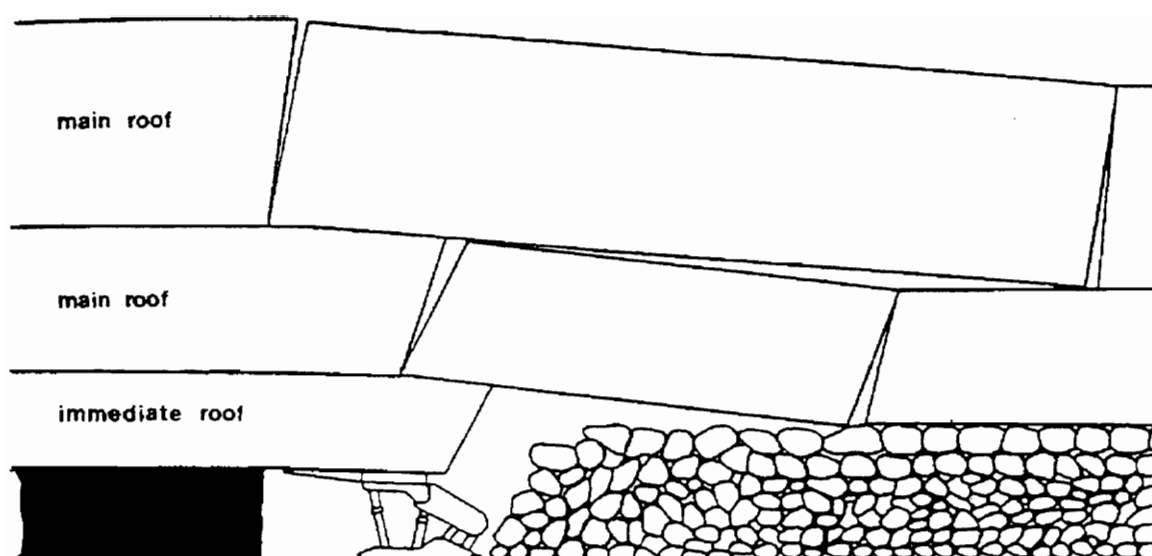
Location of immediate roof and main roof rock strata with respect to the coal seam and the longwall face (after Peng and Chiang, 1984).
